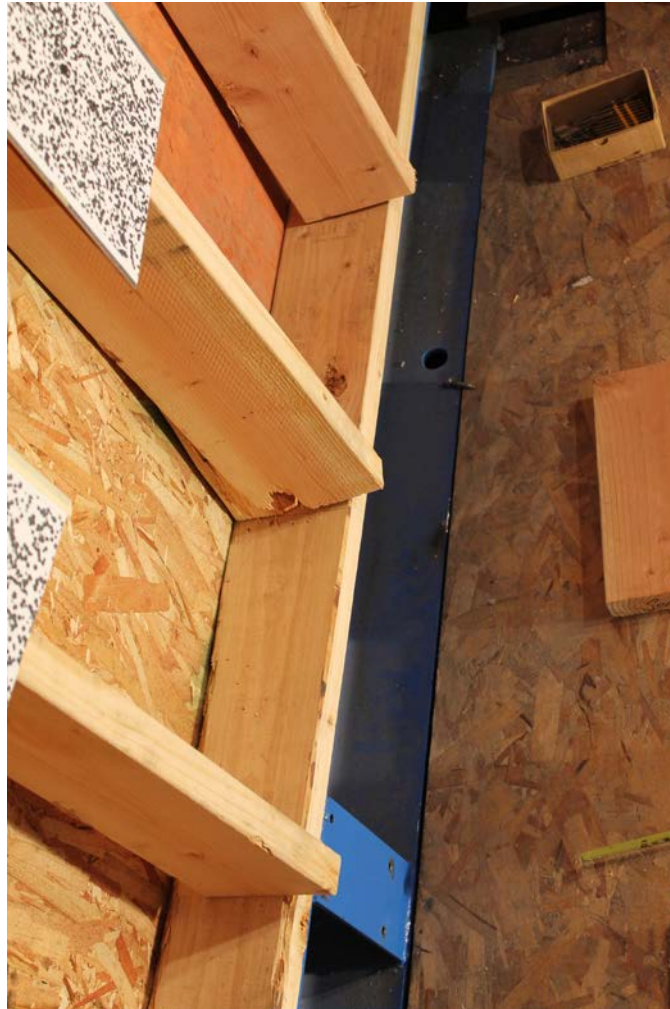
FAIL1 Trial01 failed connection of stud to bottom plate
